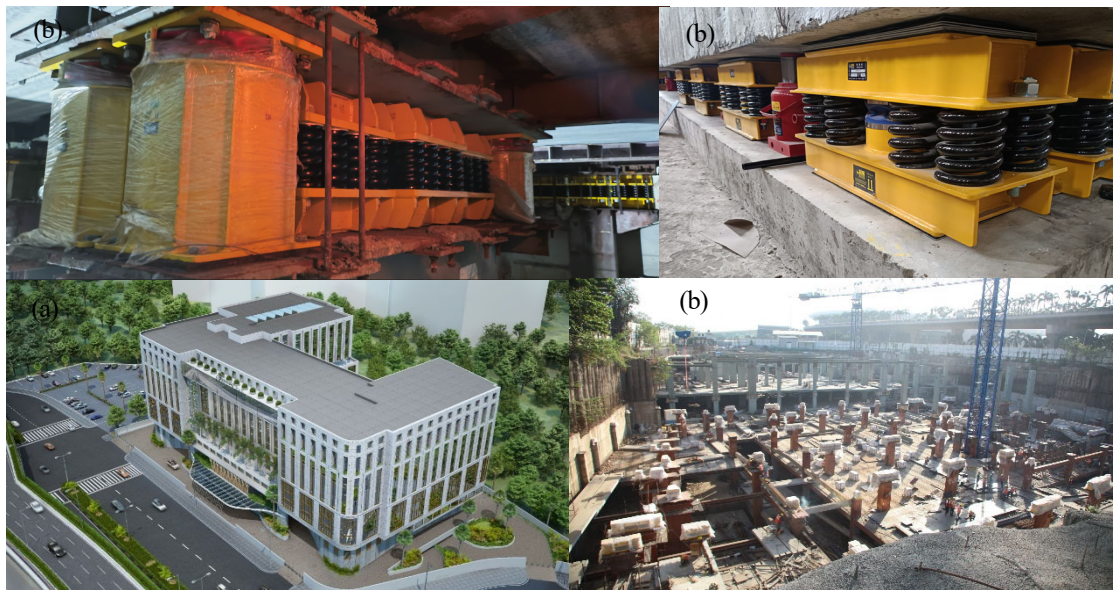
Details of the (a) Proposed Shrem Fairmont Airport Hotel Project and (b) Isolator Units and its Installation
